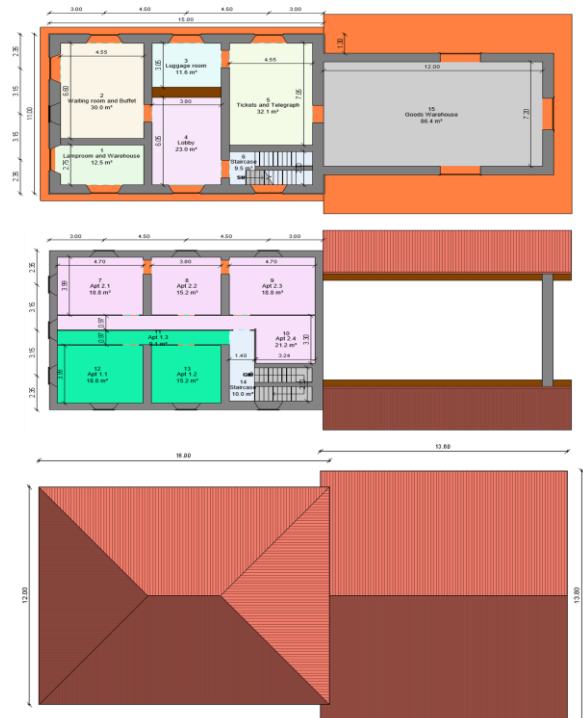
Pignola Station BIM model: ground floor, first floor and roof.
